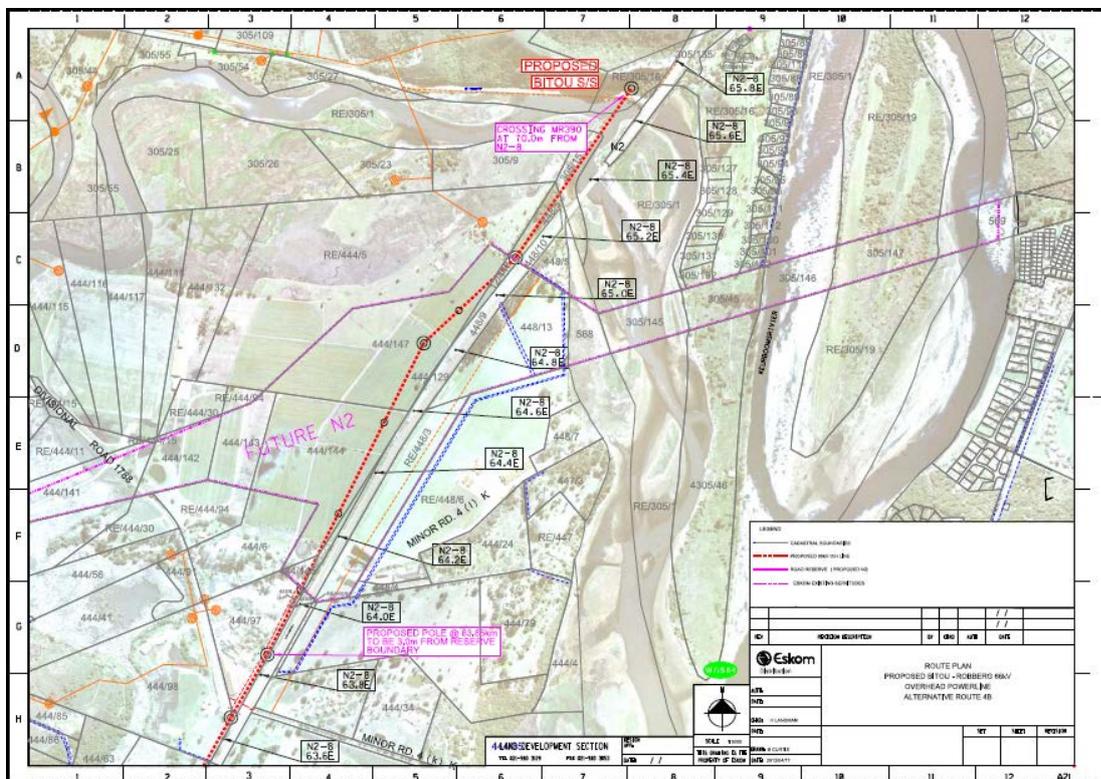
Site plan showing the direction of the proposed power line route (dotted red line) and supporting pylons.
